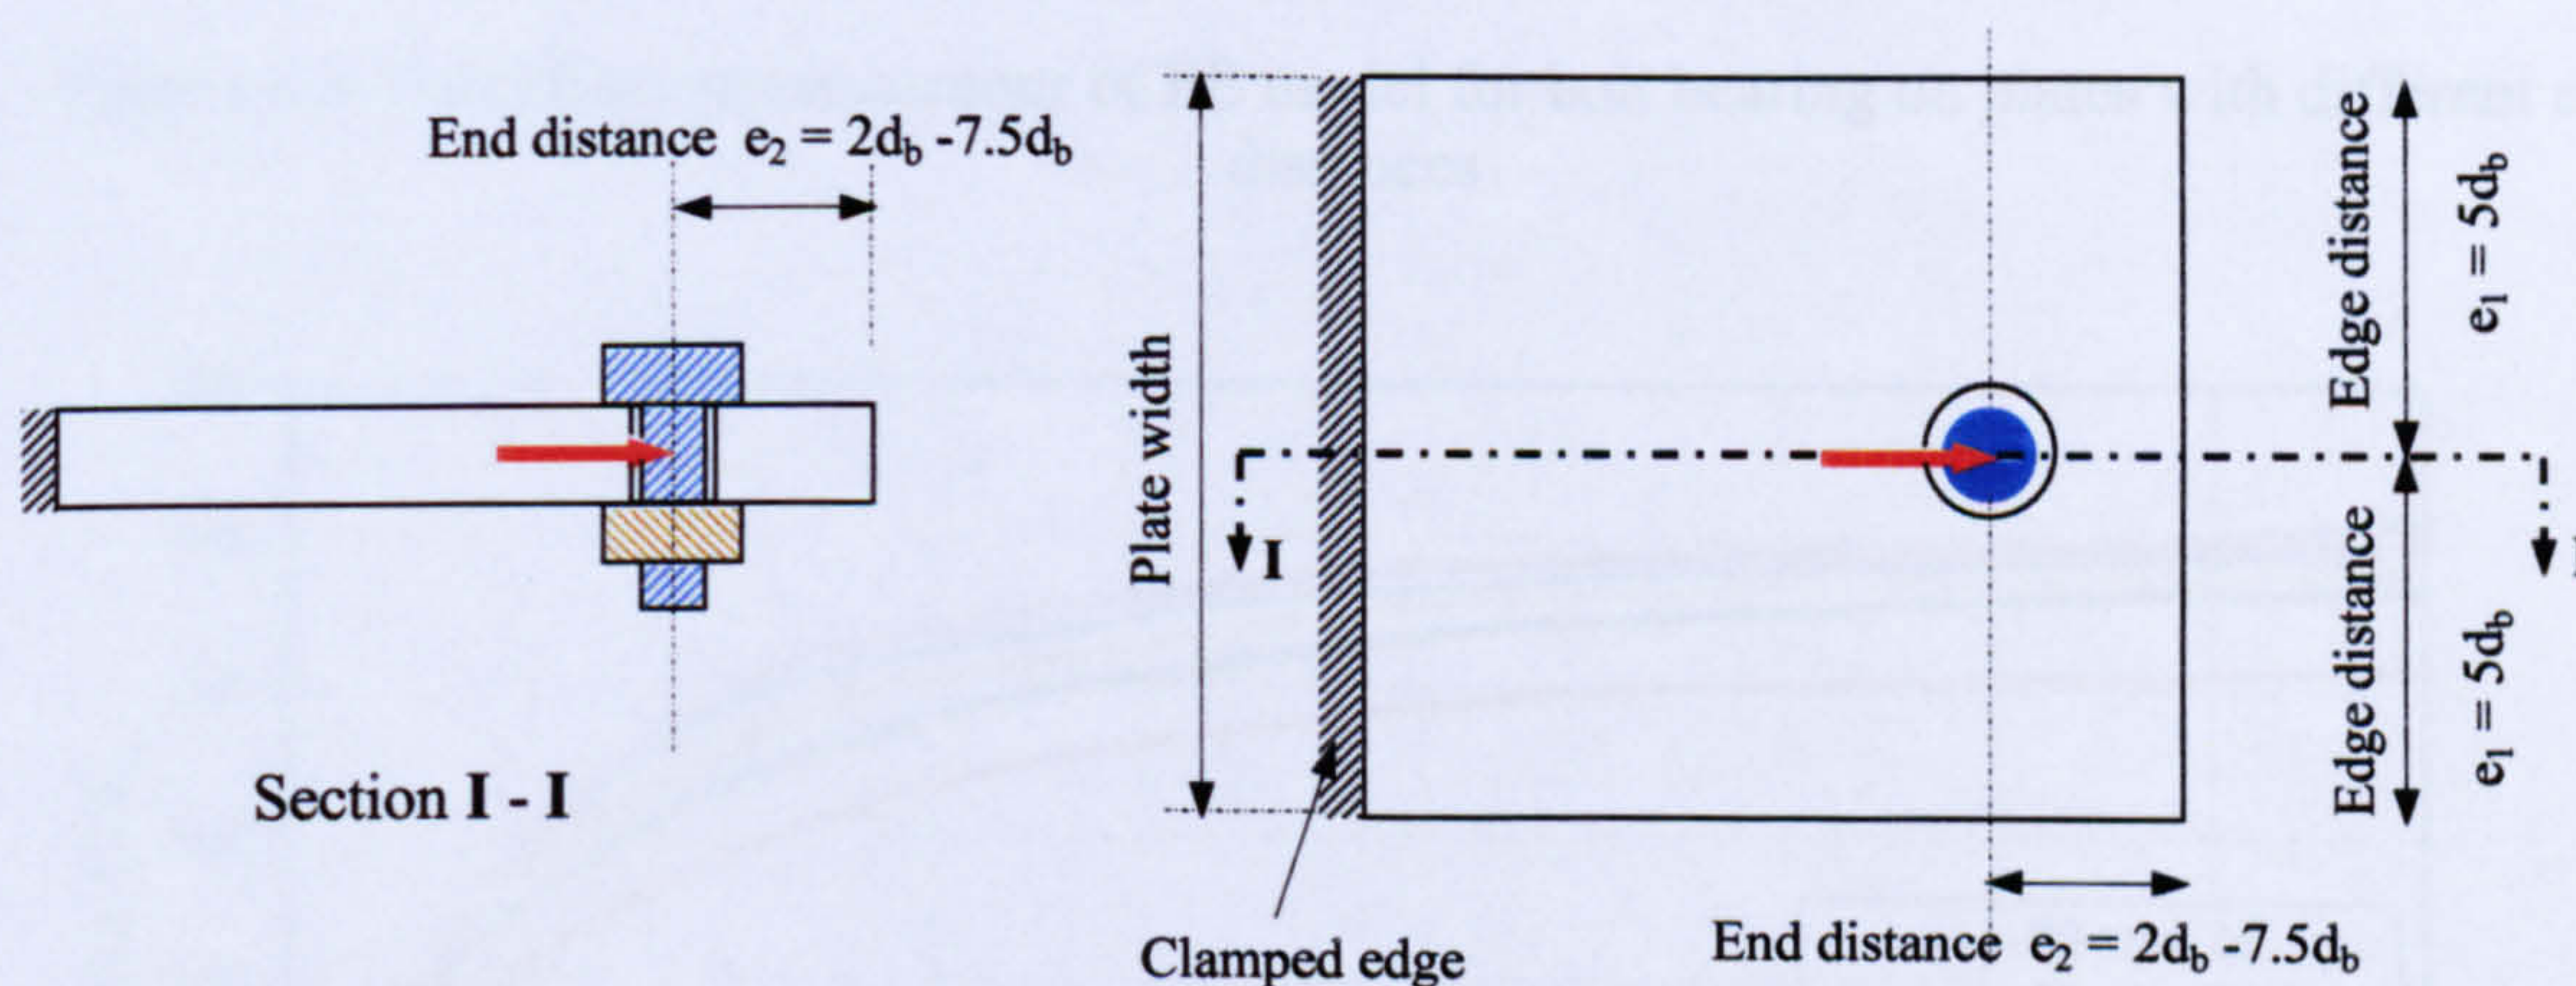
Geometrical detail of the plate studied under bolt bearing
